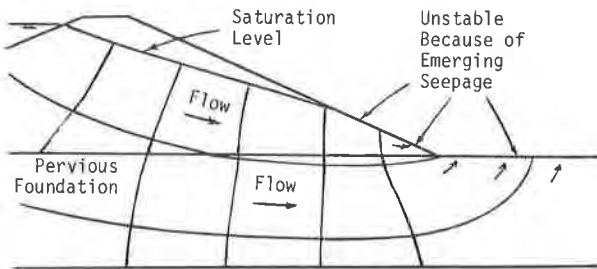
Cross section through a typical dam or levee having no drainage system.
